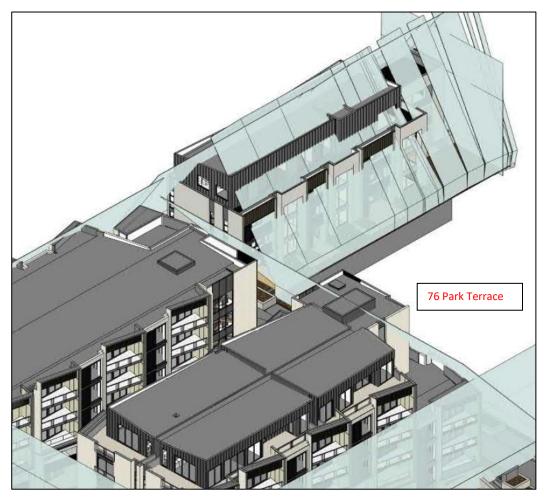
View looking southeast showing the extent of the breach of the recession plan on the western side of Building 8.
